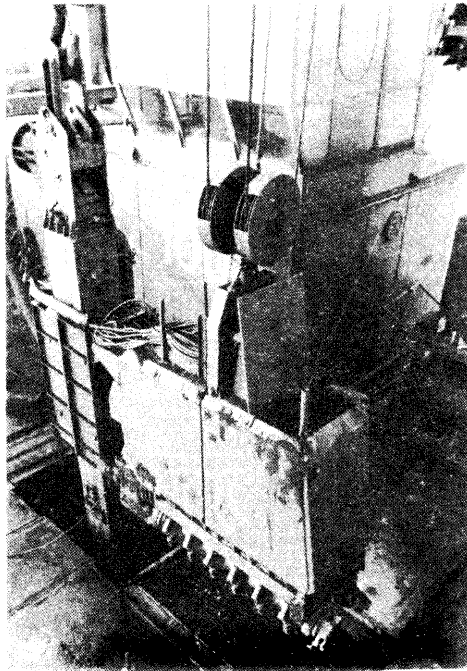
A View of the Twin Screw- Shaft Milling Device Type SG 100
